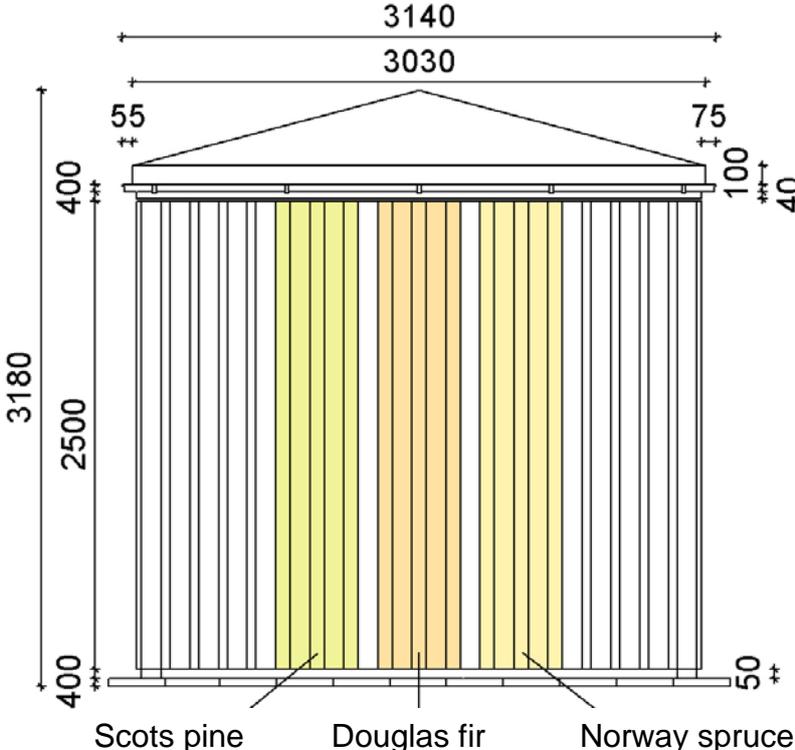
Position of test boards from different wood species in the board-on-board cladding of the test house (dimensions in mm)
